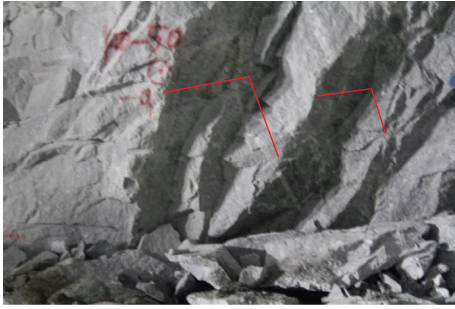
Damage of the top arch joint of the upstream side wall in the K0 + 100 m of the pilot tunnel in the main powerhouse.
